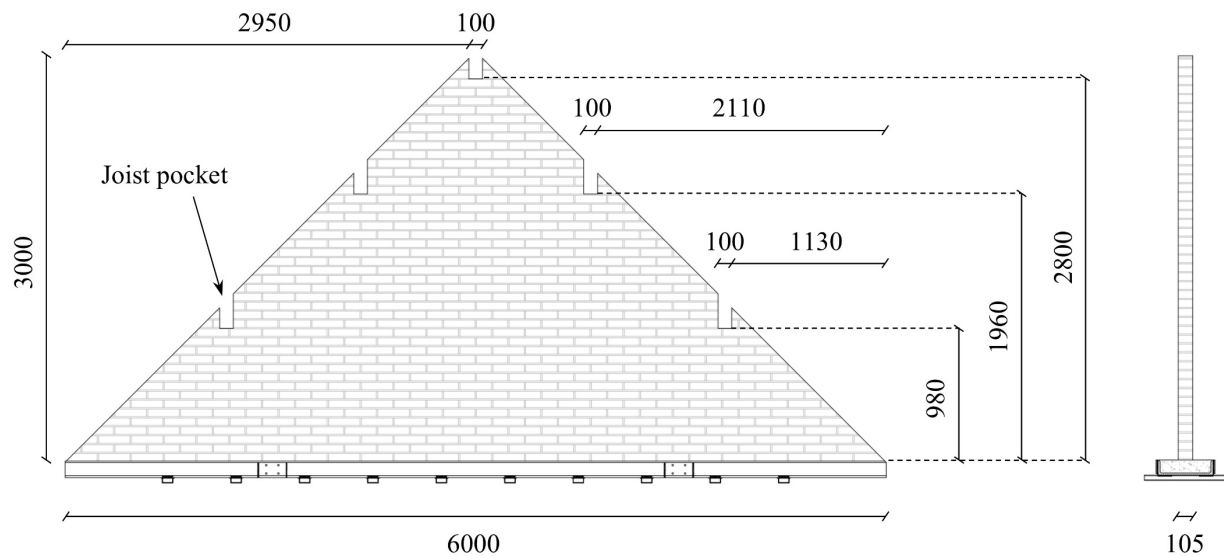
Full-scale masonry gable specimen details. Units of mm.
